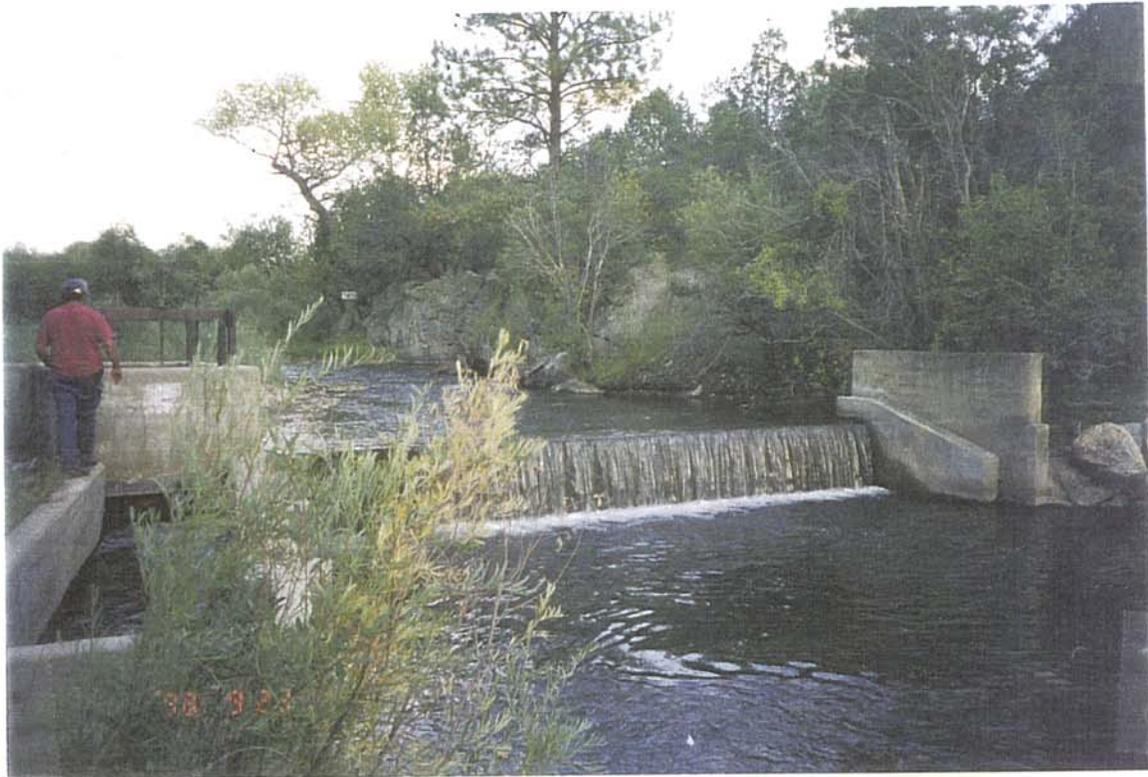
Highline Ditch Diversion Structure (Picuris Pueblo) - Diversion structure headworks is on lower left side of photo. Erosion has undermined this headworks box structure (close-up is shown in Photo No. 16).
